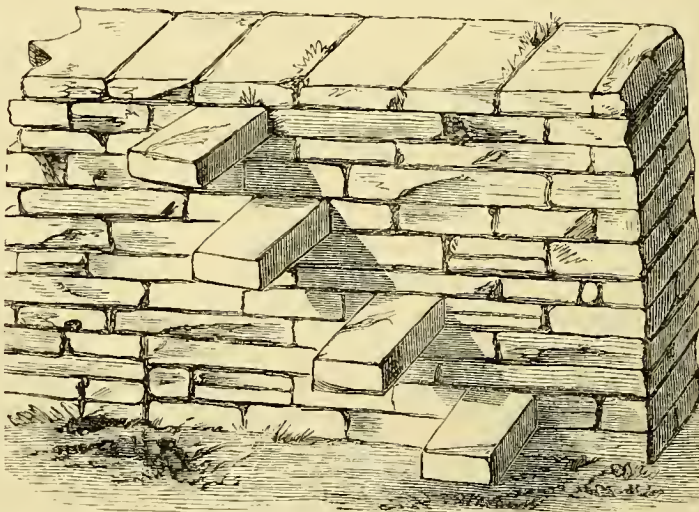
STONE STEPS PROTRUDING FROM STONE HEDGE OR WALL.
